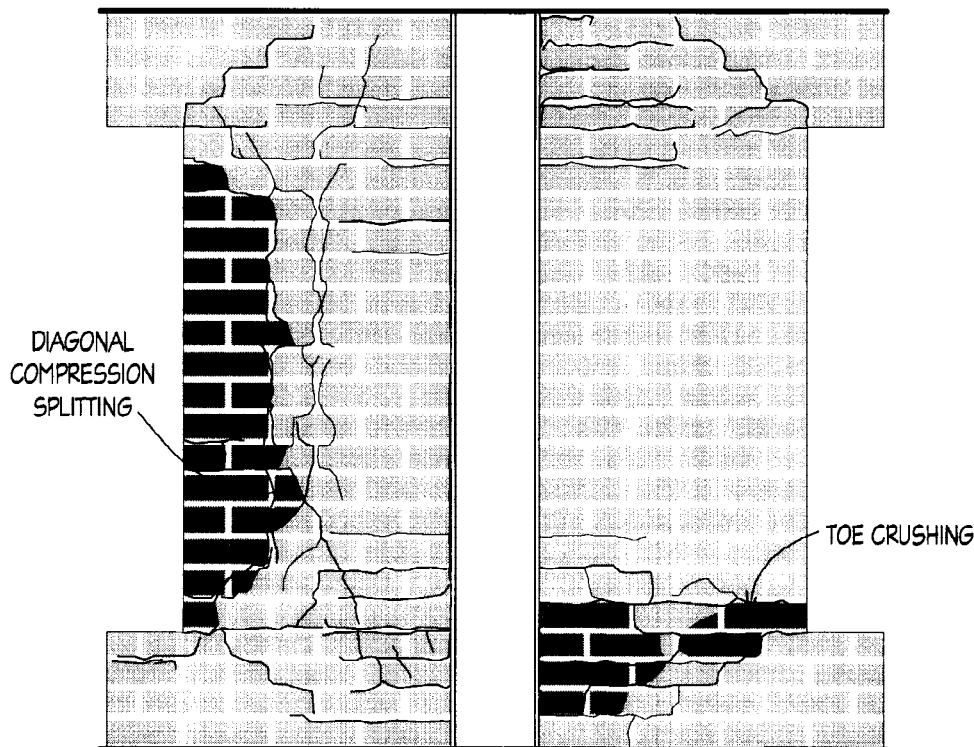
Typical Crack Patterns, Specimens 2 and 3
